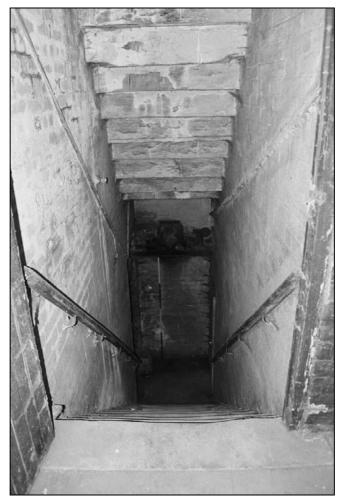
View down staircase to G22, west range, from F10 south range (film 26.22)
